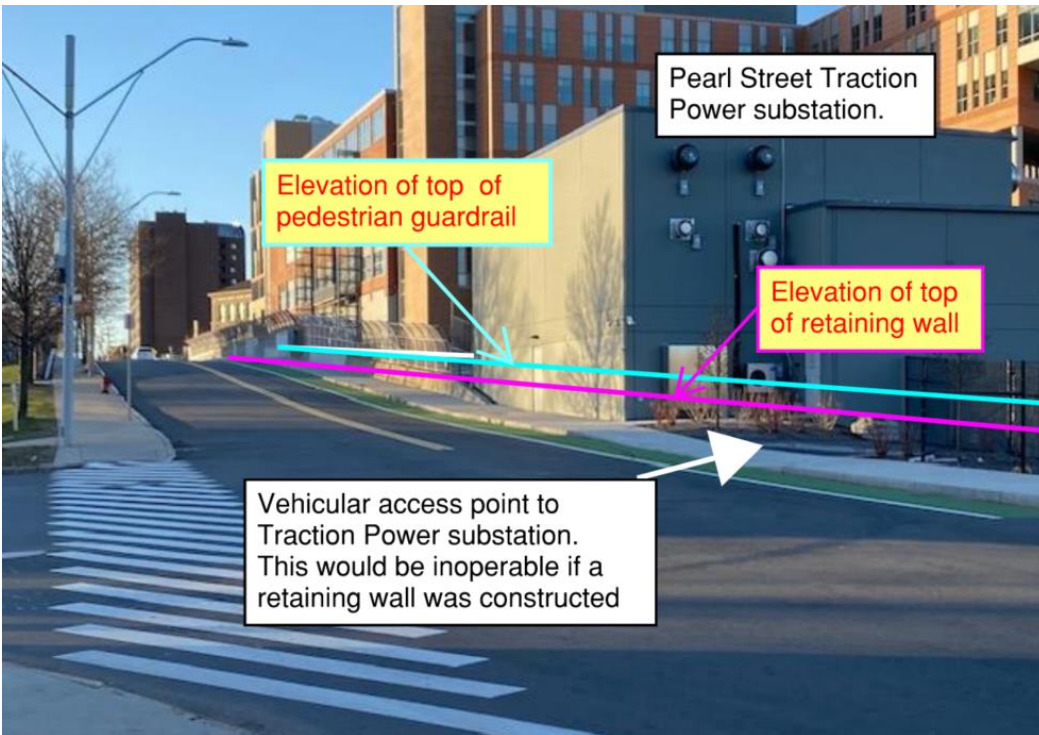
Medford Street looking South (to rail bridge and to PSTPSS)
